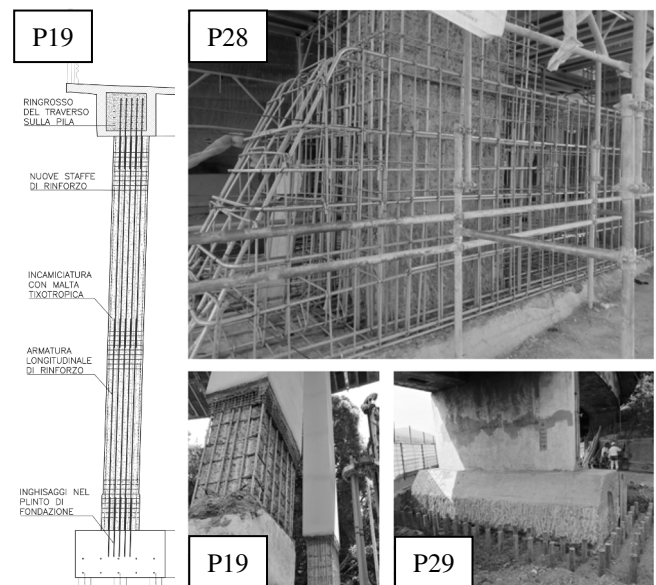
Reinforcement of the piers and foundations of P19, P28 and P29 / Rinforzo delle pile e delle fondazioni di P19, P28 e P29.
